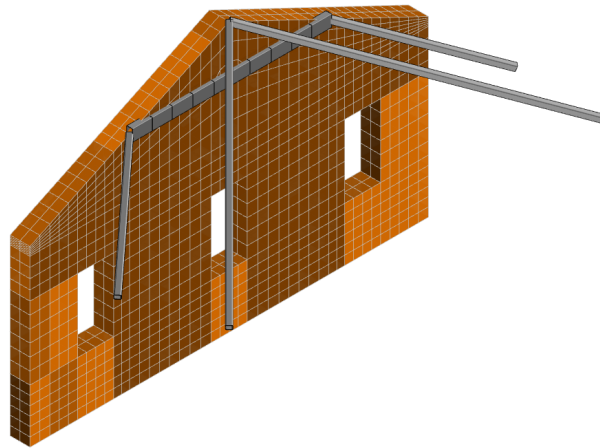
Isometric View of Fog Room Gabled Wall, Diamond Braces Scheme
